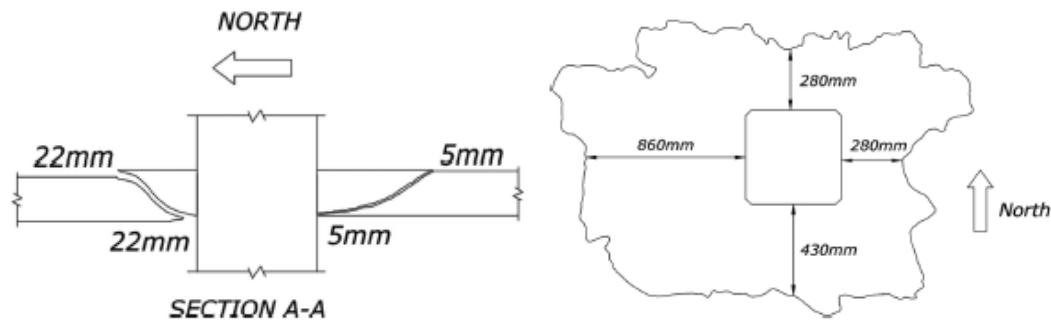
a) Vertical section after failure in punching shear and b) Dimensions defining boundaries of shear failure [5].
